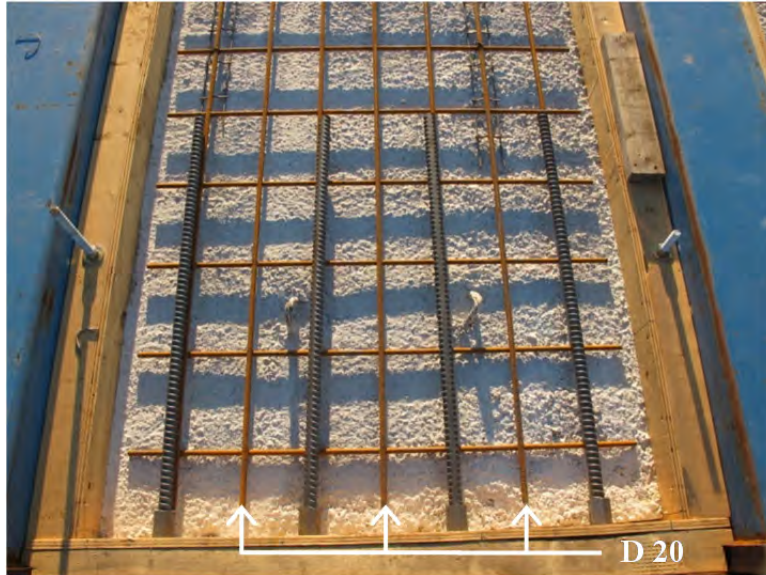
Arrangement of reduced welded-wire reinforcement, restrained-shrinkage test
